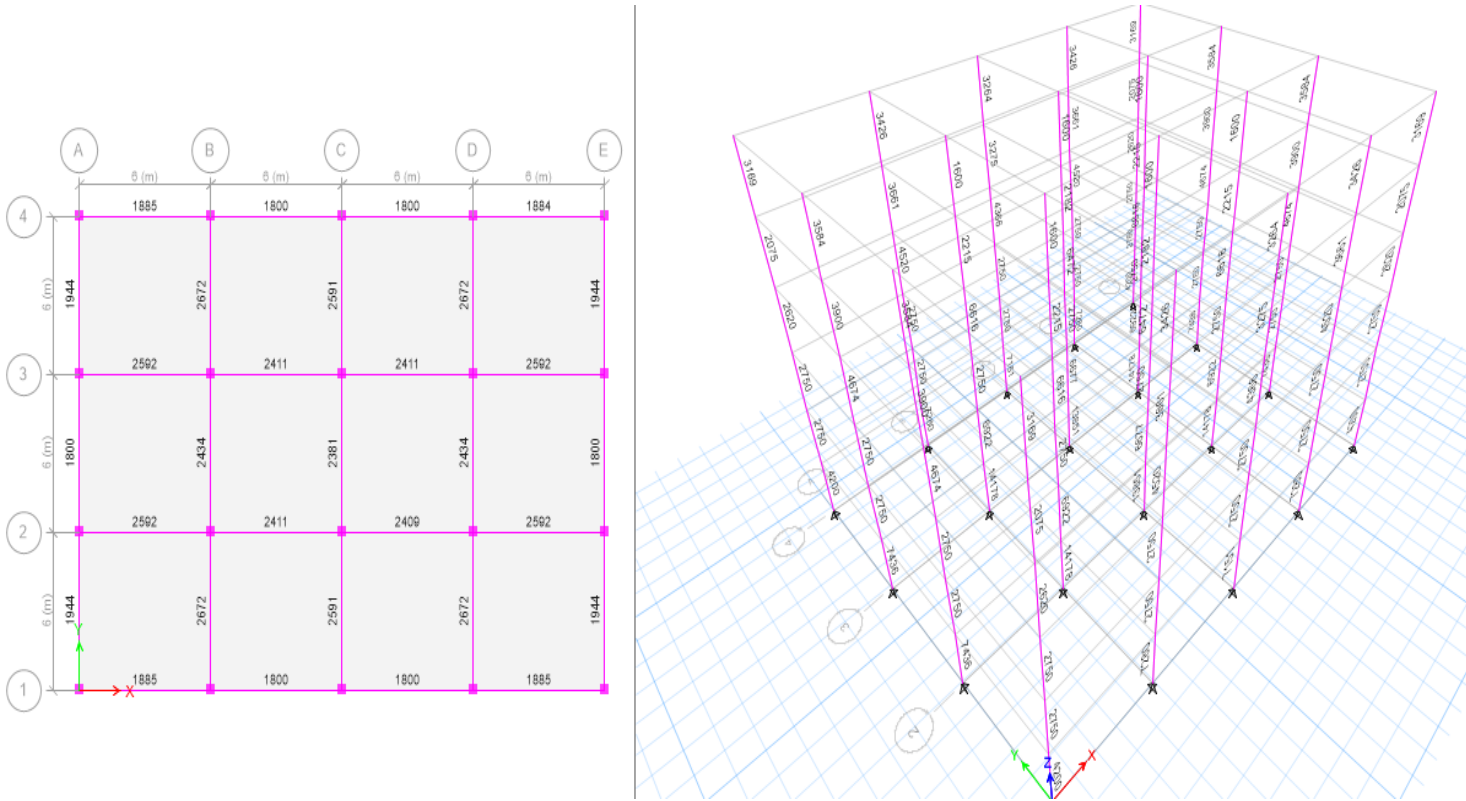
Output Design of the 6-Story Structural Building Showing the Required Reinforcement Area (mm).
